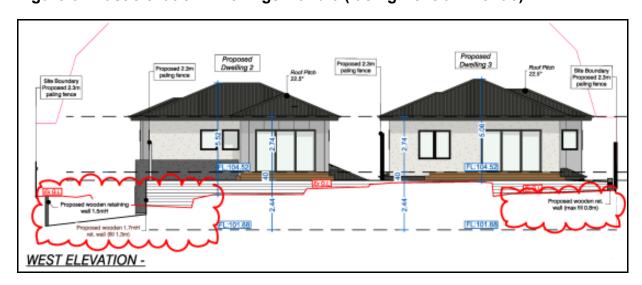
West elevation Dwellings 2 and 3 (internal)
